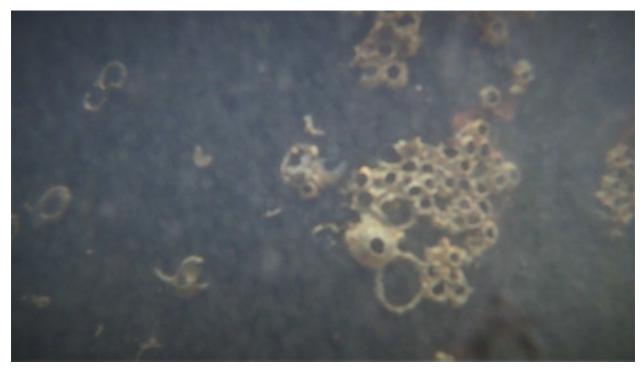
Steel sheetpile face along the Southernmost Hotel showing attached filamentous algae and barnacles.
